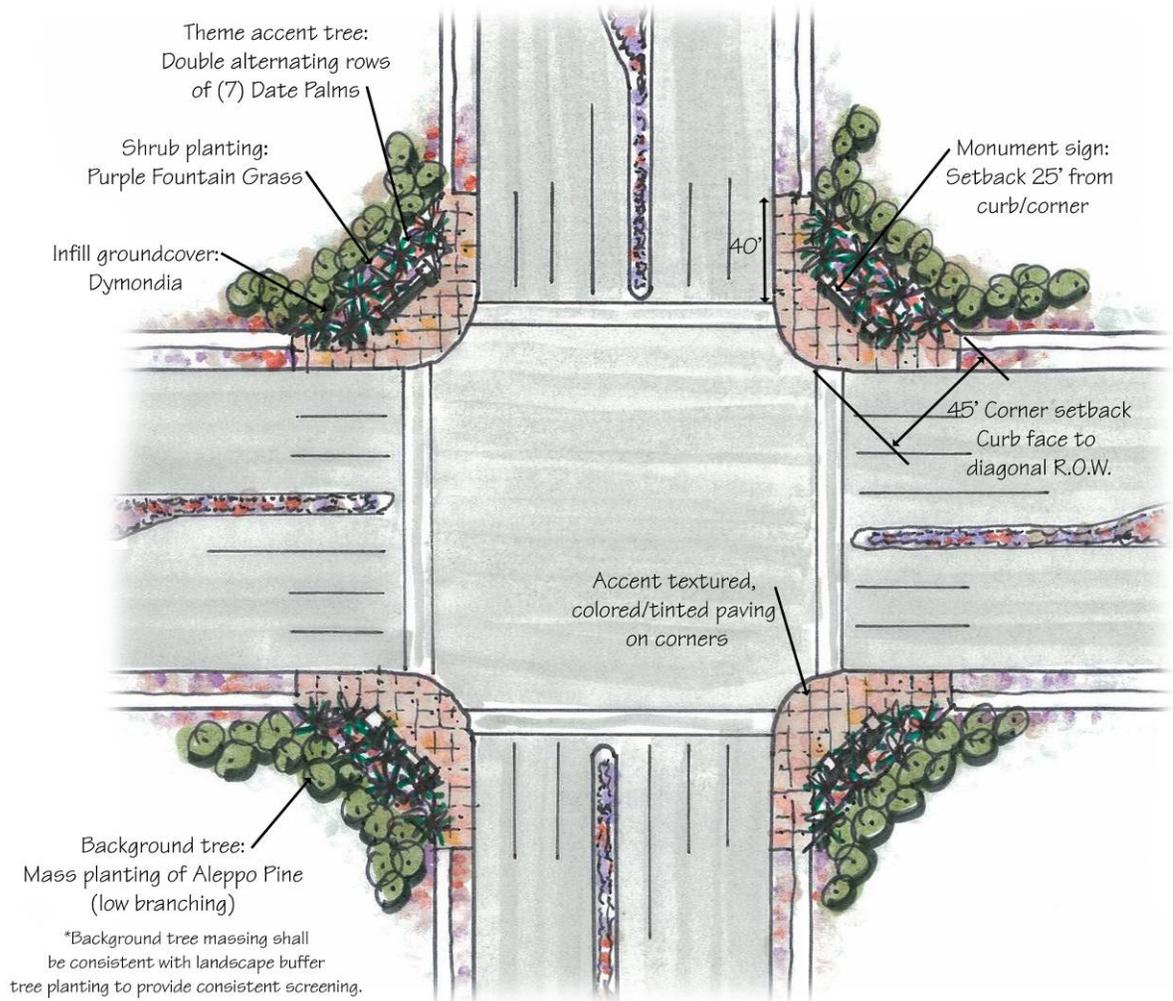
Secondary Gateway Intersection Enhancement Concept
